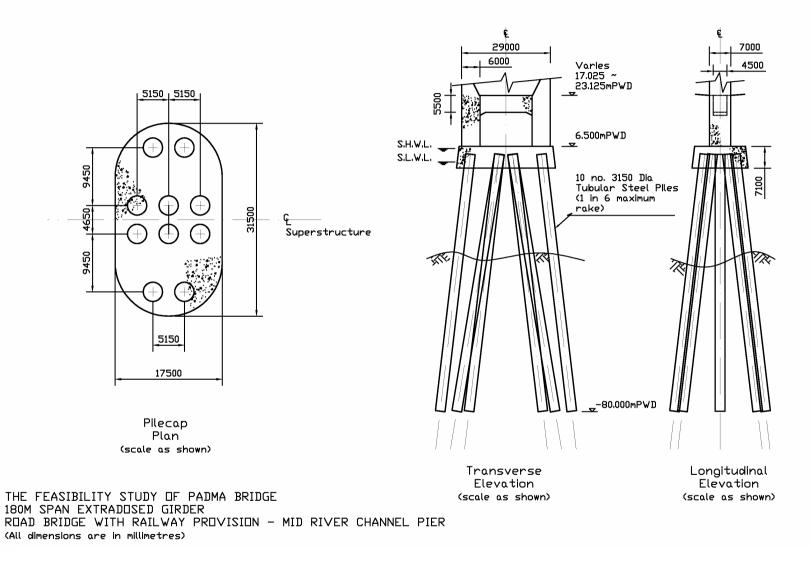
Mid-River Substructure General Arrangement (Alternative-HR)
